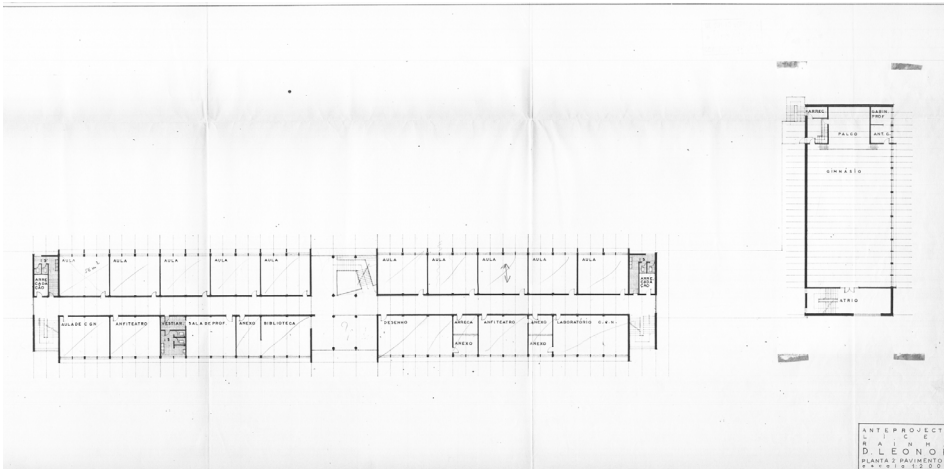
Plan of the first floor; showing the development of the rooms along both sides of a central corridor.
